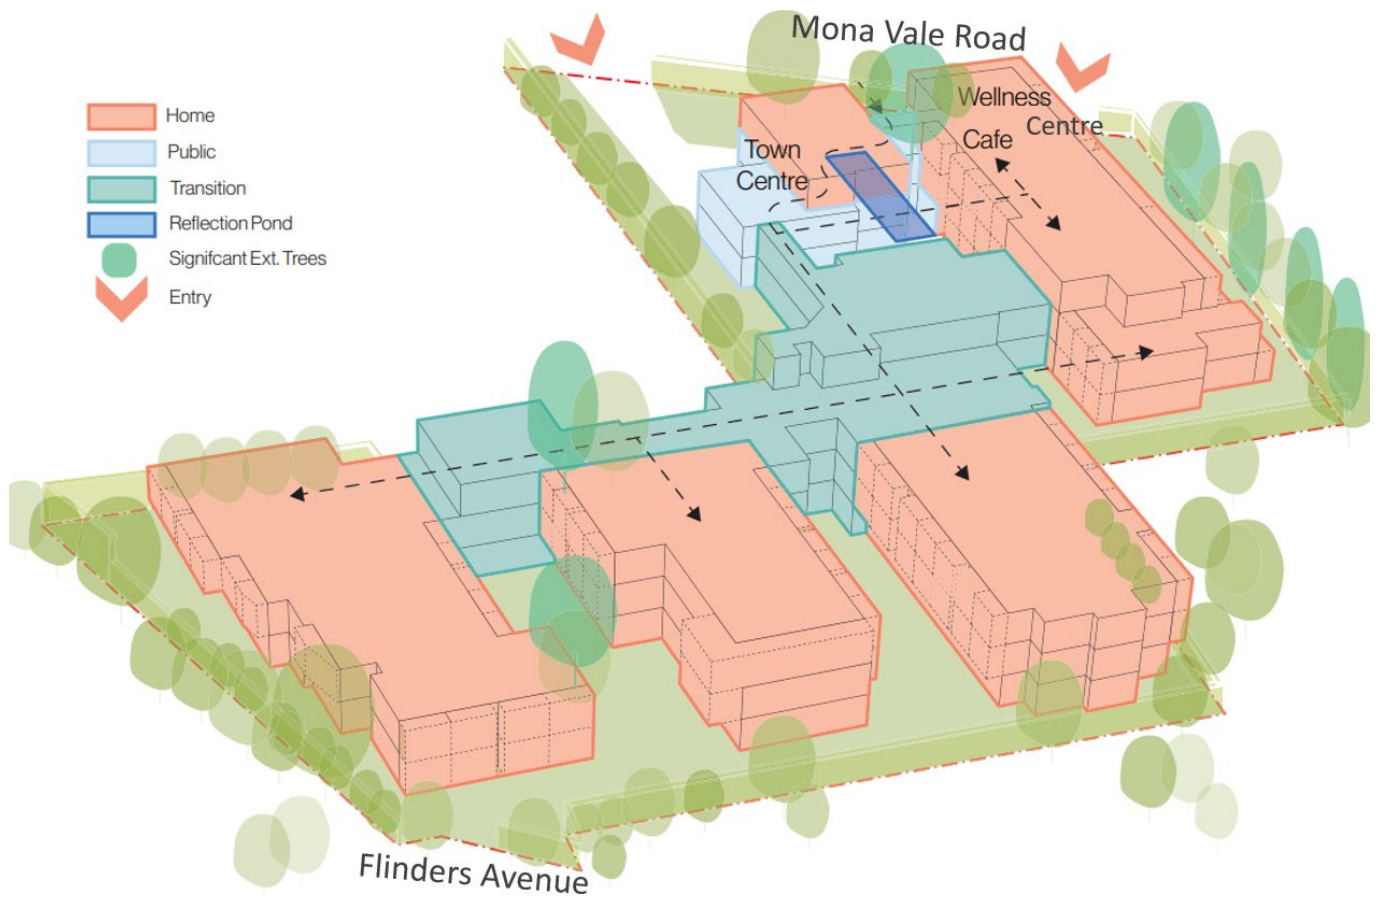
| Proposed building massing (Source: Applicant's EIS)
